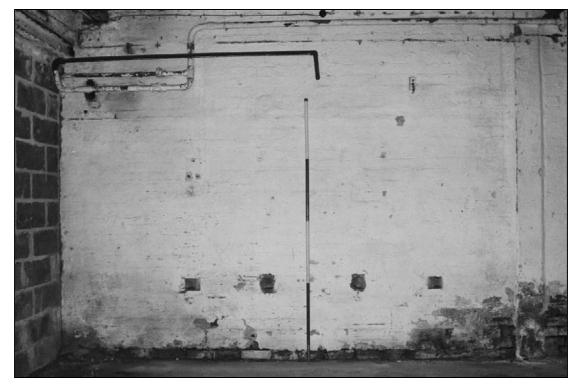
Detail of north wall of G5, north range – note sockets in wall indicating removed workbench (film 21.13)
